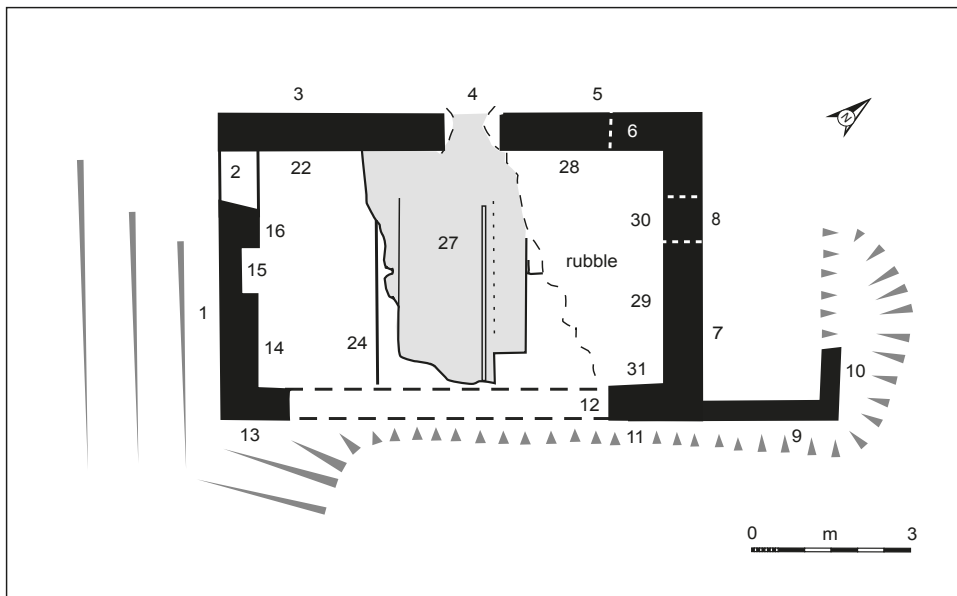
Ground plan of the fish house. (Drawing by John Pickin)
